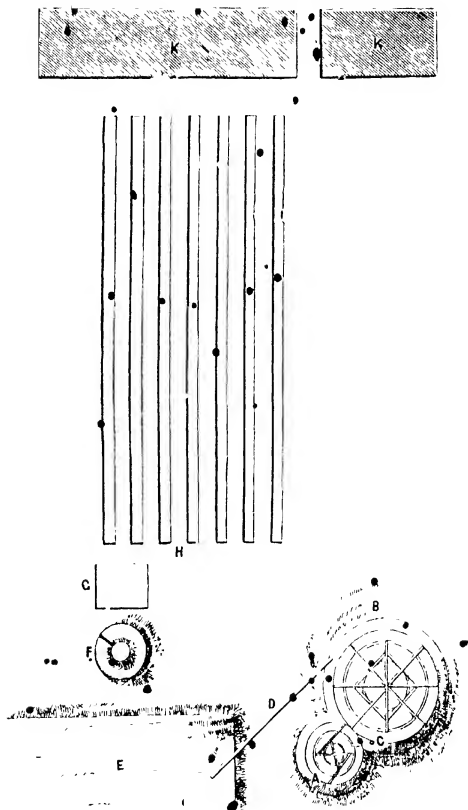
General plan of a brickwork. Scale 40 ft. to an inch.
